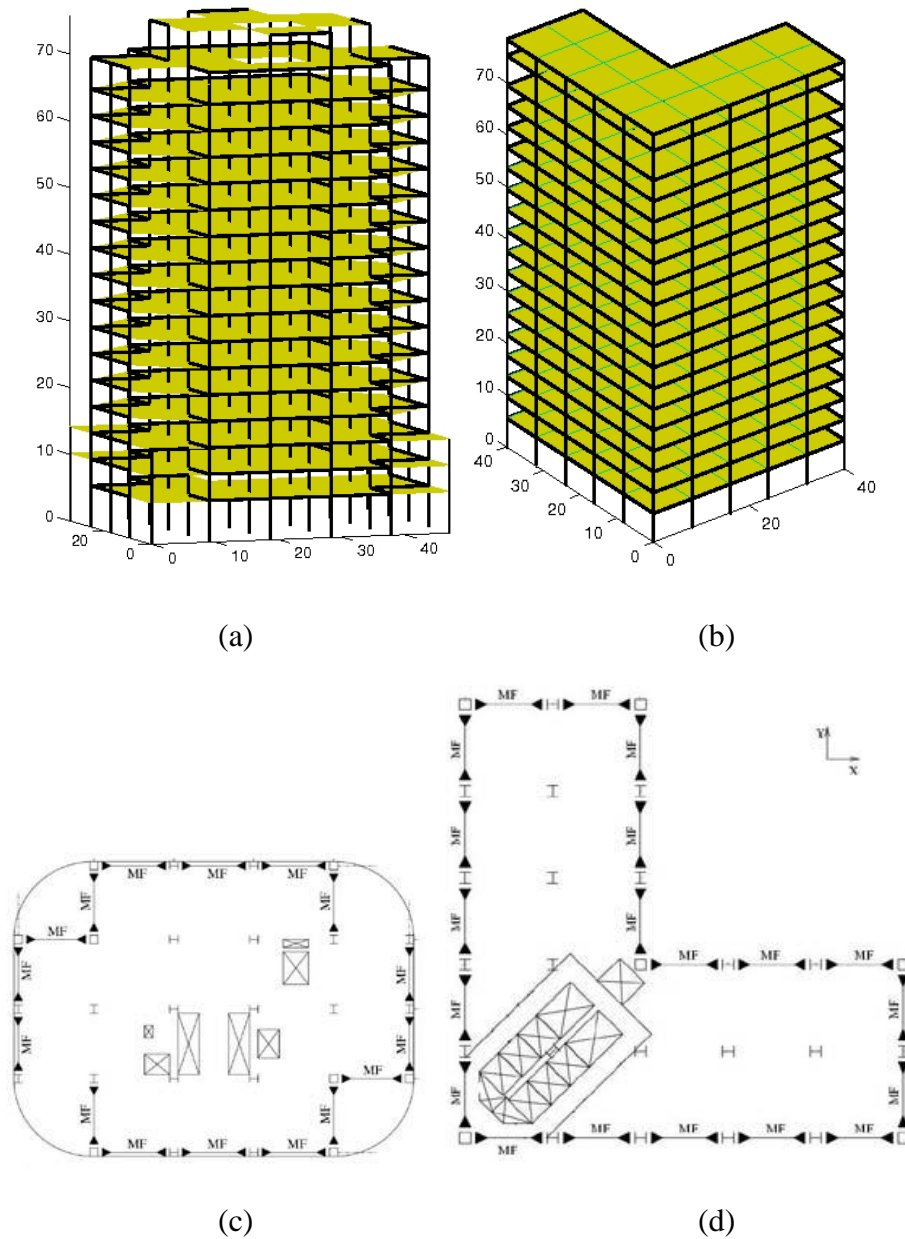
Building 2 (Schematic (a) and Floorplan (c)), and Building 3 (Schematic (b) and Floorplan (d))
